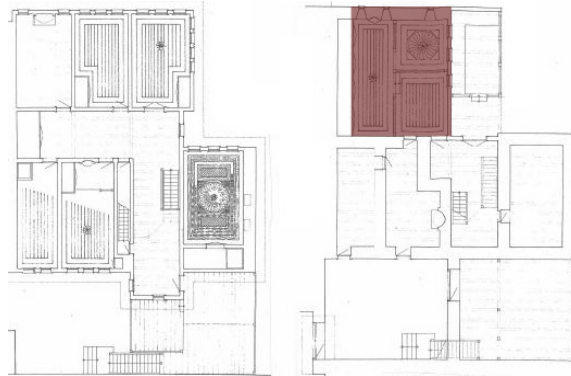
Tevrüzlü House-first and ground floor plan (Sefer, 2005)
